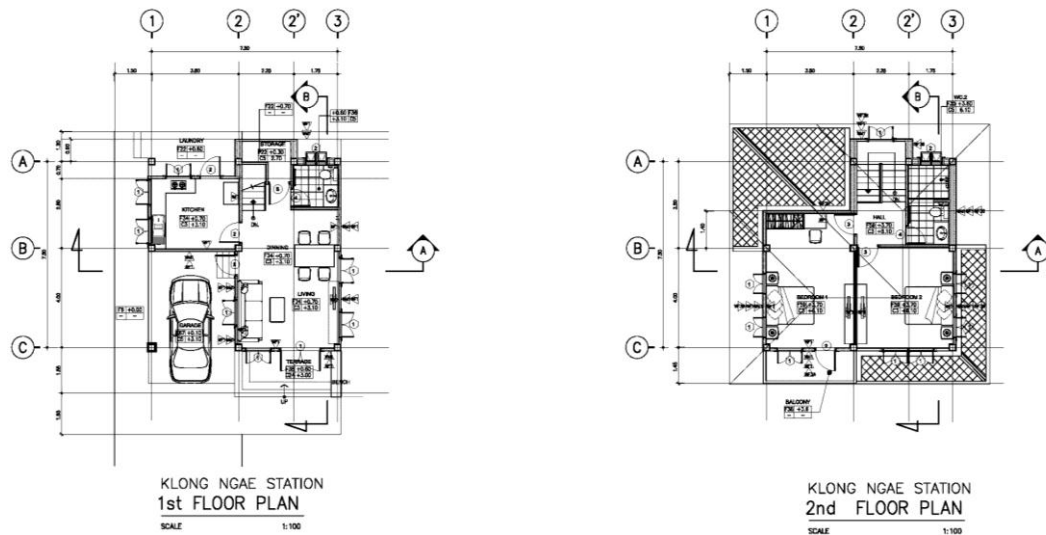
The Staff Lodge Type-B Plan at Khlong Ngae Station
